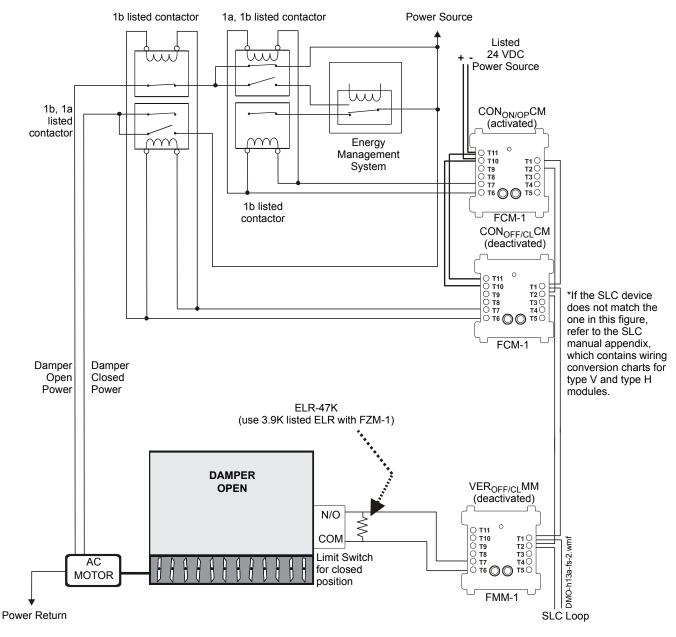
Motorized Damper Control - HVAC Switch Group Type 13
